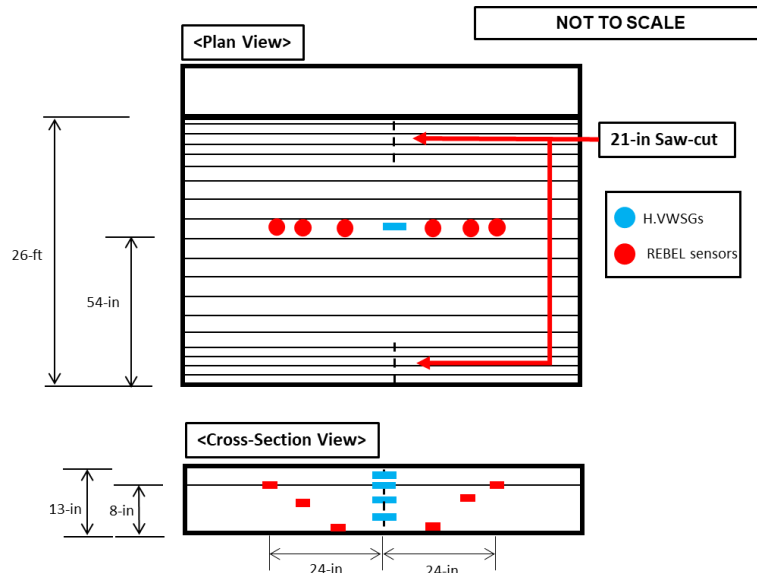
Plan and cross-section views of typical gauge installation location at STA 212+00 in Hillsboro
